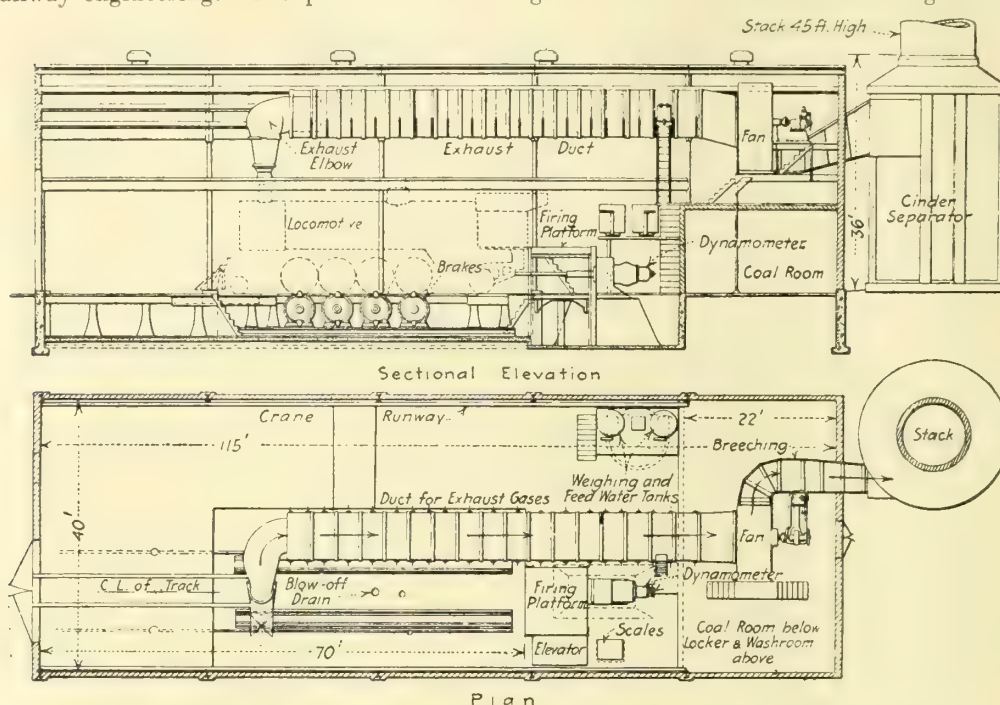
SECTIONAL PLAN AND ELEVATION OF NEW LOCOMOTIVE TESTING PLANT AT UNIVERSITY OF ILLINOIS.
